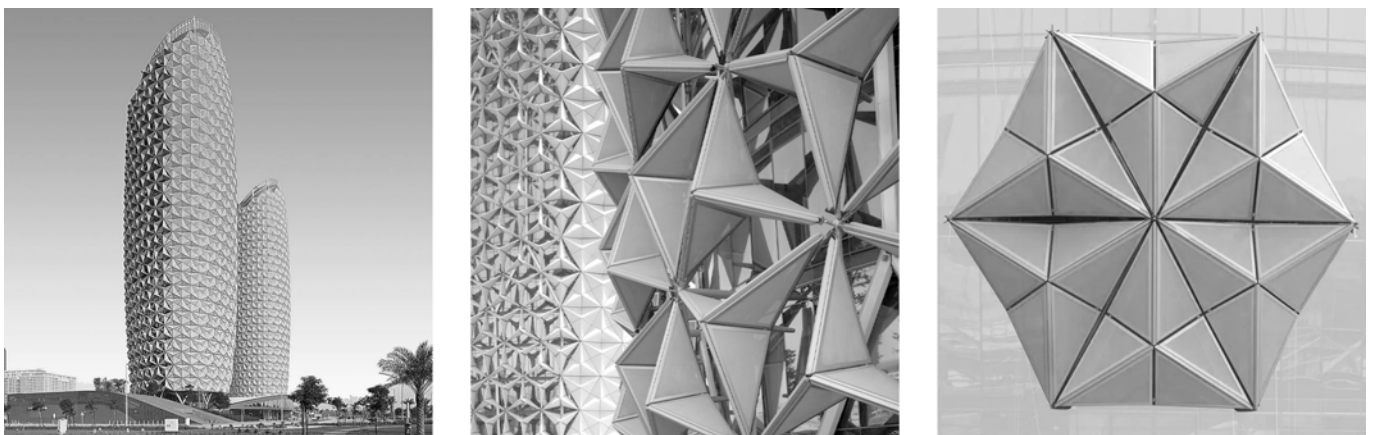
Al Bahar Tower in Abu Dhabi, designed by Aedas Architects, building elevation, texture and texture tile.
